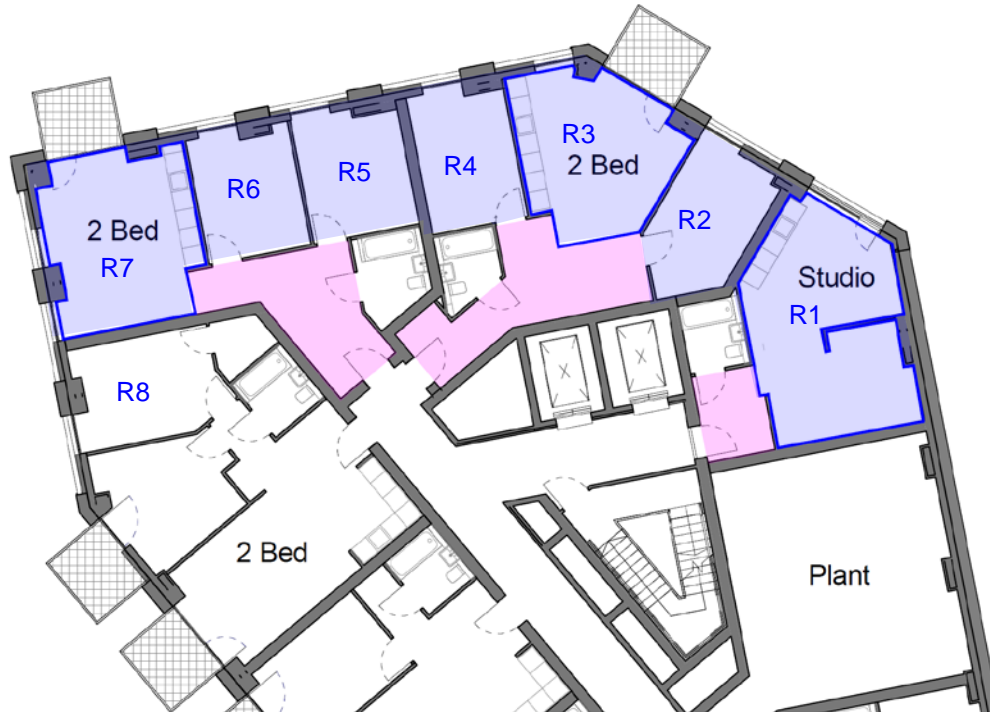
Annotated extract from first floor plan of North Island Building No. 3 (drawing no. TH-IS_ZZ_001_A_16092_(P00)_P101 rev. P00). Room references in blue font (R1, R2, etc.) are those used by Point 2 in its impact assessment. Rooms shaded blue are habitable rooms that take light from over the Site. Areas shaded pink are hallways/circulation spaces.
